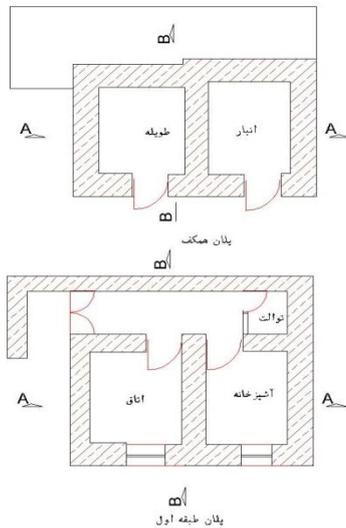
ground and first floor plan of the second sample of rural house , (authors)
